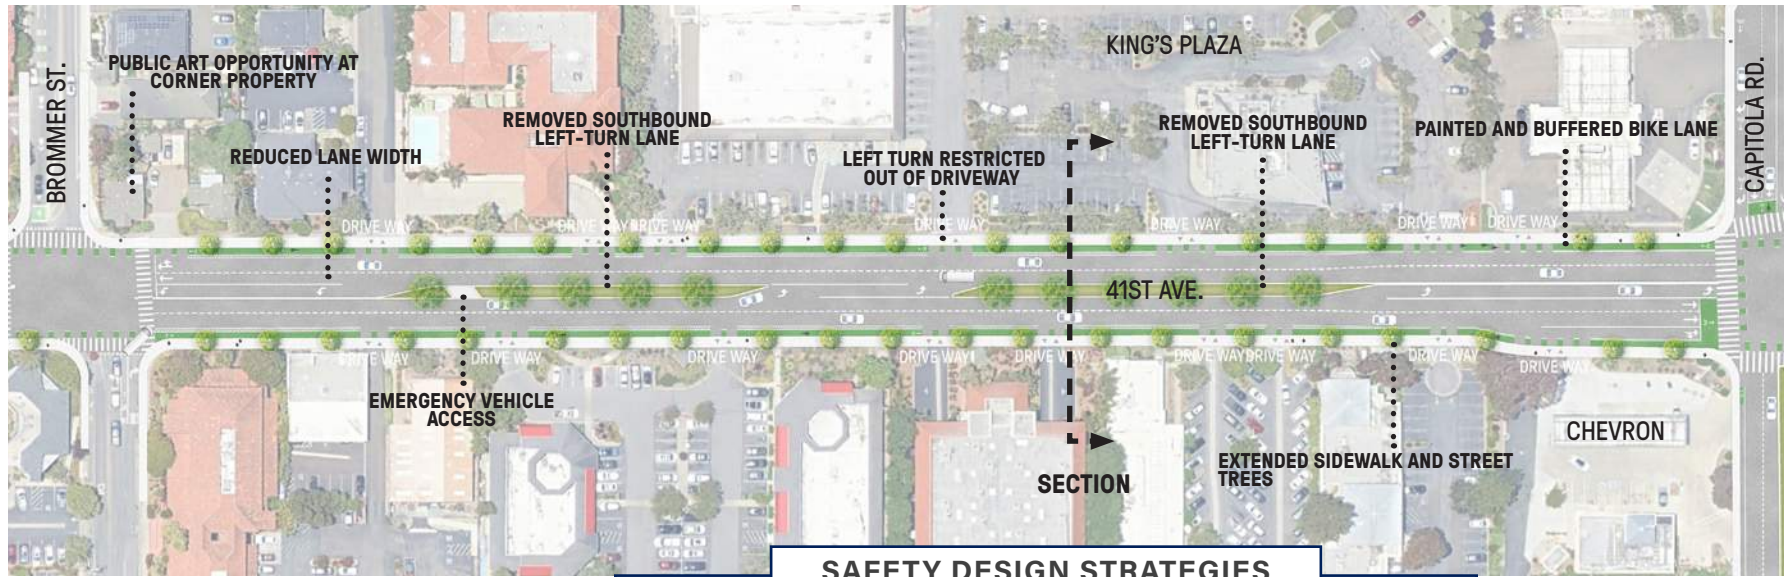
CAPITOLA ROAD TO BROMMER STREET
